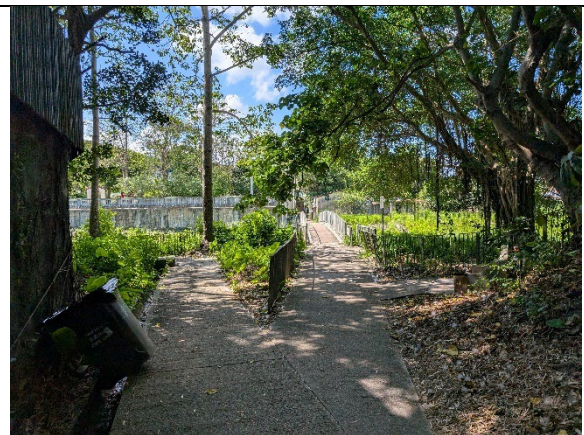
Existing 300mm U-channel running between the eastern subject site boundary and an existing external footpath (3 of 3)
